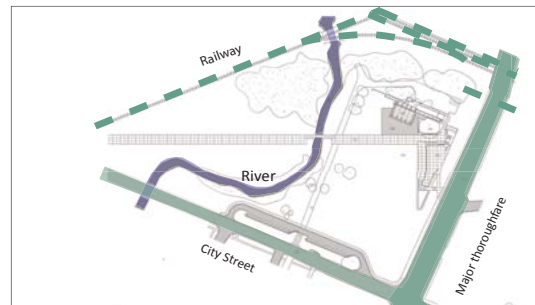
The site uses the existing boundaries of the railway, the river and main highway to frame the main stage space
